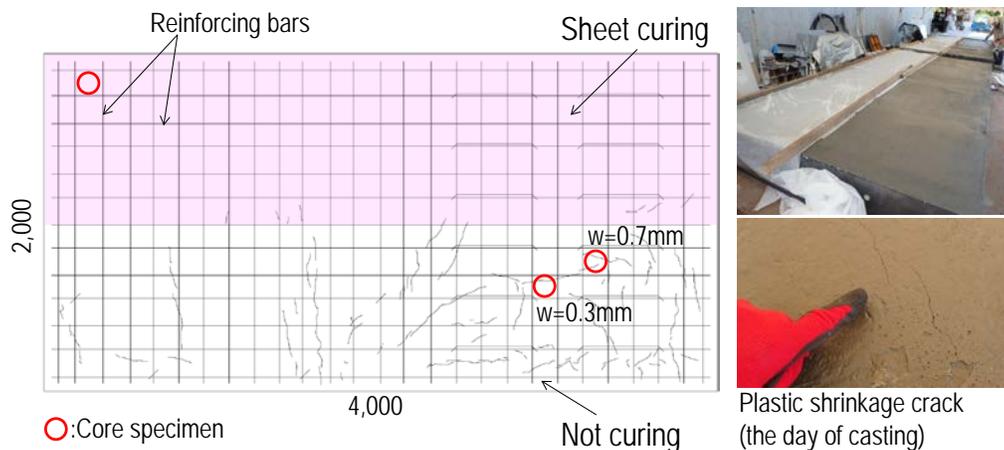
Crack pattern of the top surface of UHPFRC the day after casting
